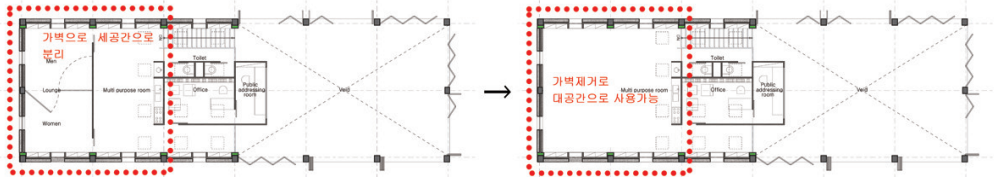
Plan of 2nd Floor \_ Senior Centre \_ Diversity of Space
